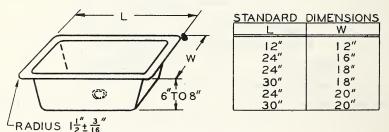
Center-outlet flat-rim kitchen sinks. (See par. 4.22.)
